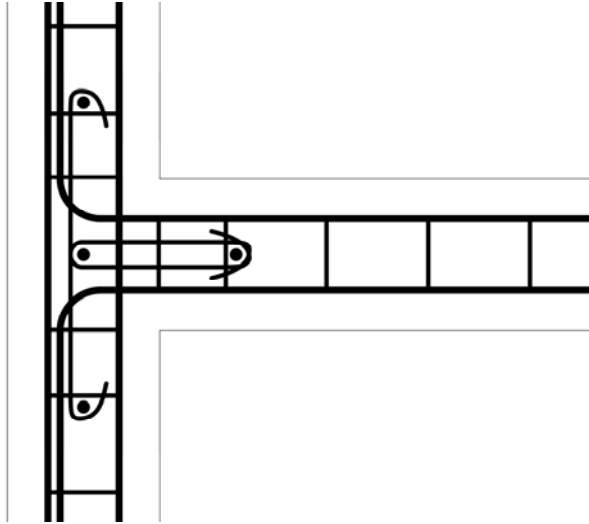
Detail of reinforcement in a T-crossing (Sill beam)
